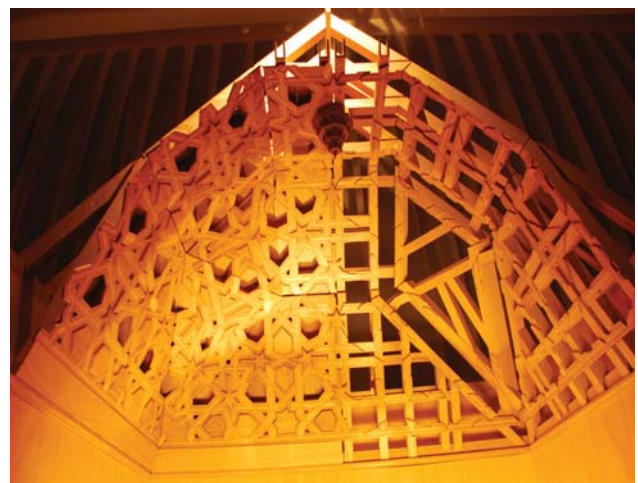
Islamic ceiling model made in wood with construction details. Science Museum of Granada, Spain.
